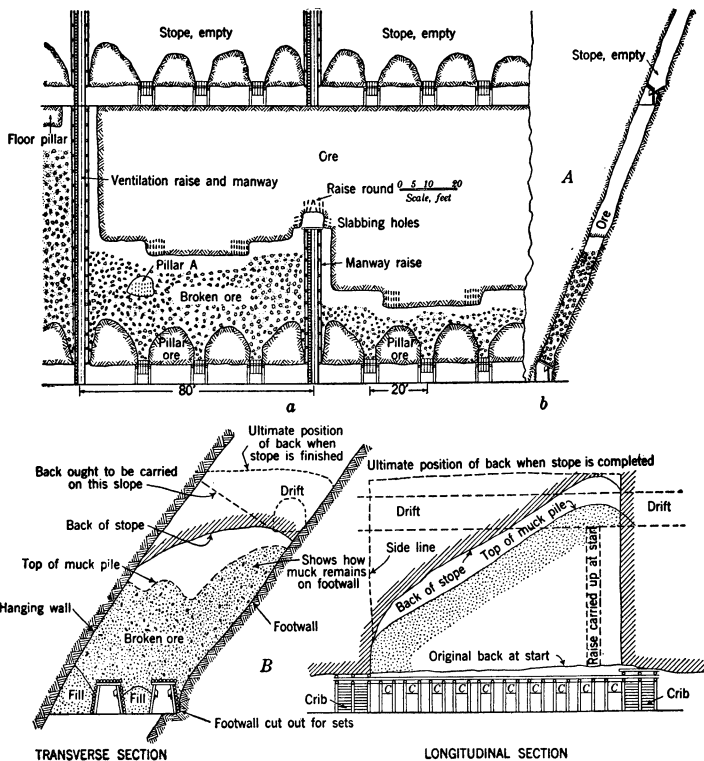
A, Shrinkage stoping on drift pillars in narrow vein: a, Longitudinal vertical projection; b, vertical cross-section; B, sections of longitudinal stope, Franklin, N. J. (after Haight and Tillson, Trans. Am. Inst. Min. Eng.).
